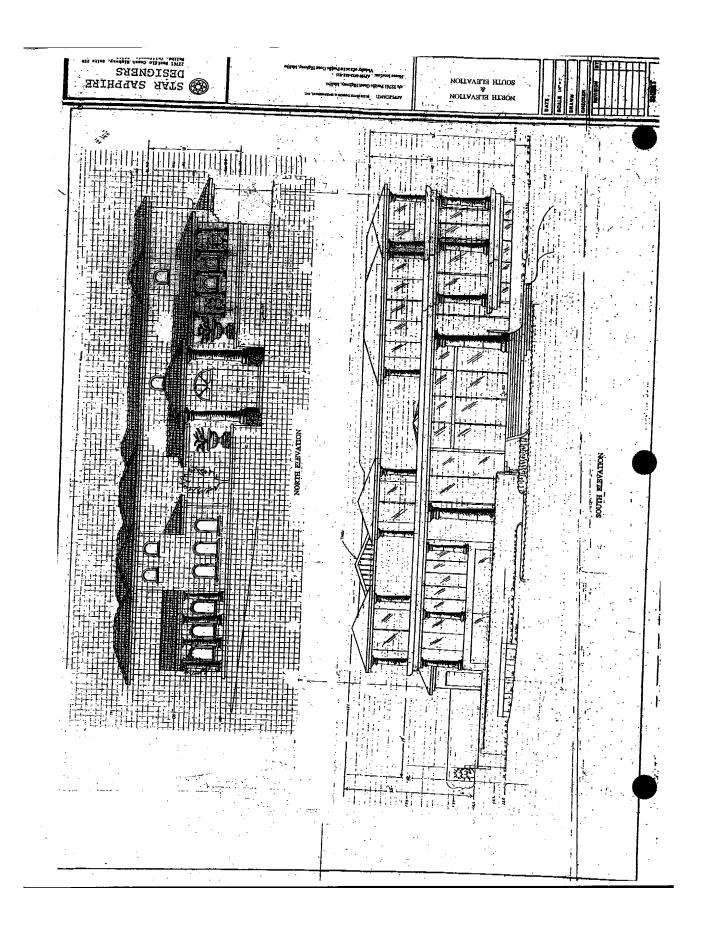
A-4-MAL-05-164 North and South Elevations
